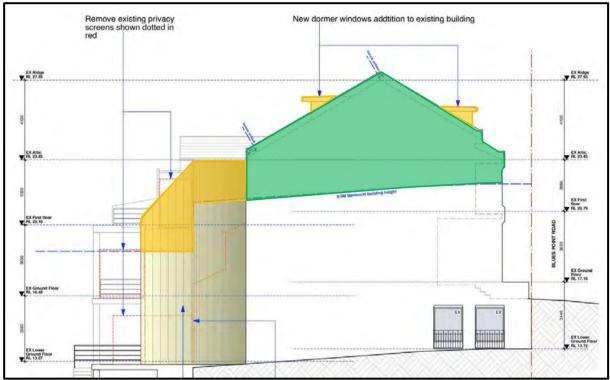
Southern elevation of proposal with non-compliant portions shown in green (existing building) and orange (proposed additions).
